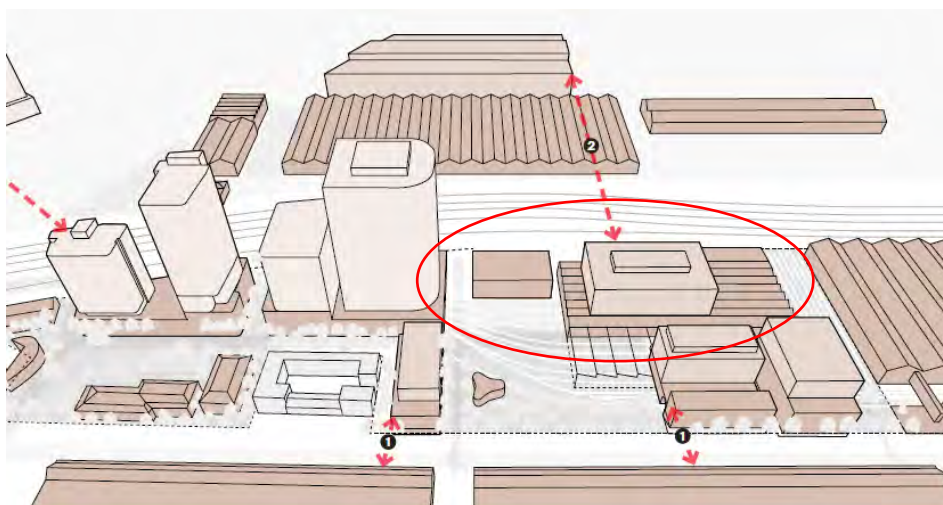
Height context diagram demonstrating proposed scale of new built form and curtilage of Paint Shop and overdevelopment adjacent to lower scale and size of new adjacent building (K1) to east (Source: Bates Smart 2022, Figure 9.5.3.1)
